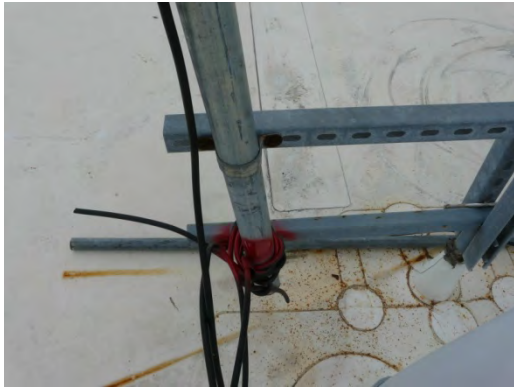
Rusted non-redundant connection of a loose antenna mast. Second connection provided with a tied cable.
